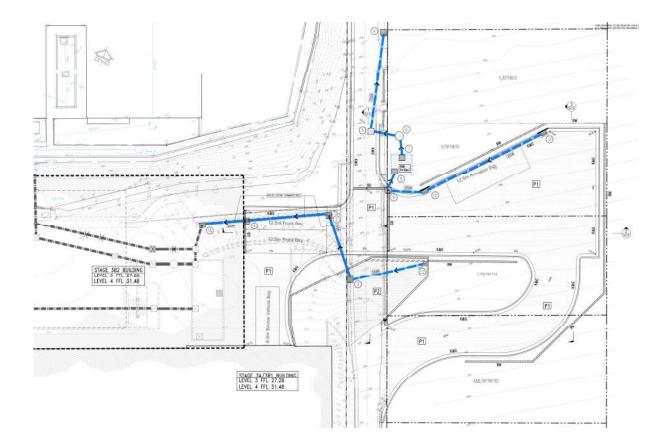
Proposed Stage 3B Loading Access Siteworks Plan
